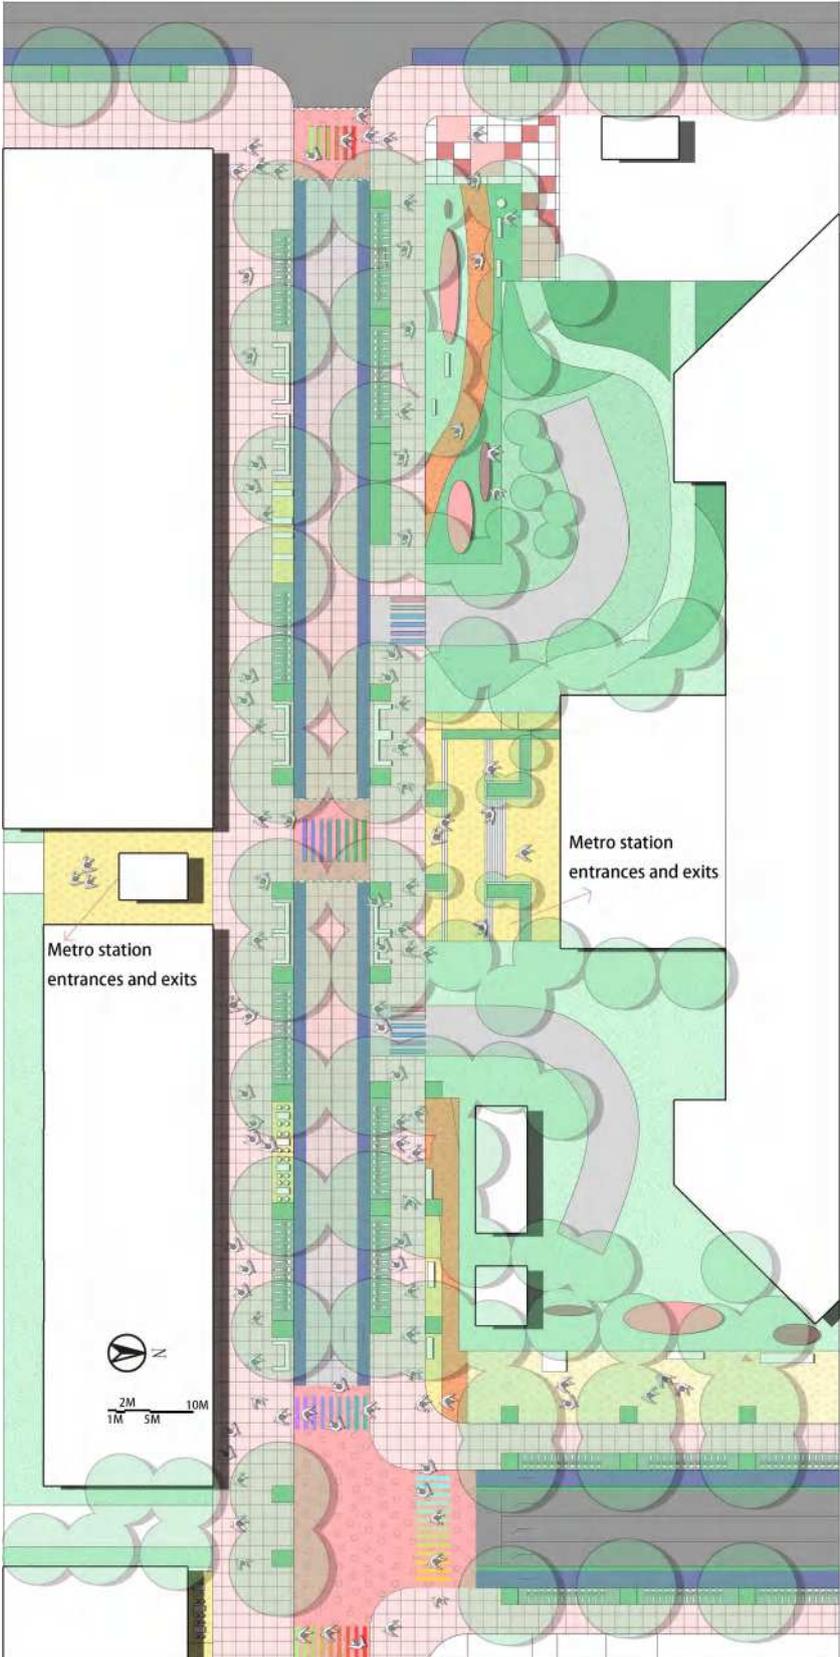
Tianhe Nanyi Road optimization plan(TeeMall part) (Source: Completed by author)
